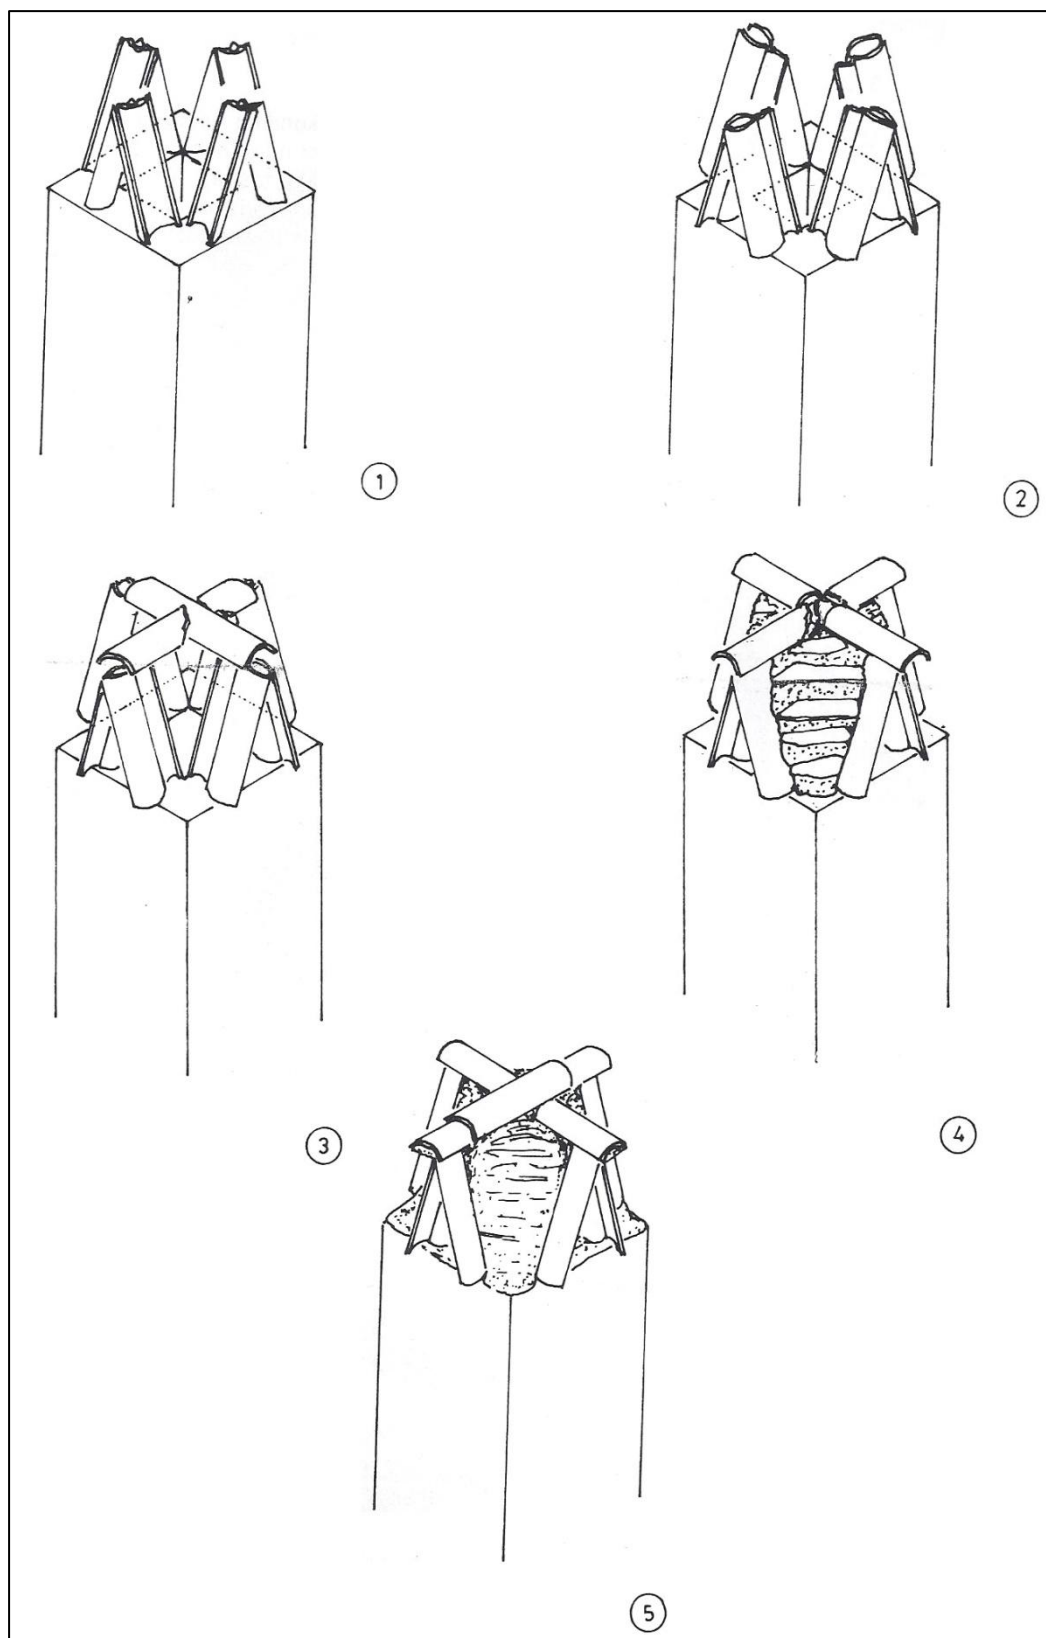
Construction Detail of the *Muğla chimney* (Source: ALADAĞ E., 1991. *Muğla Evi*)
